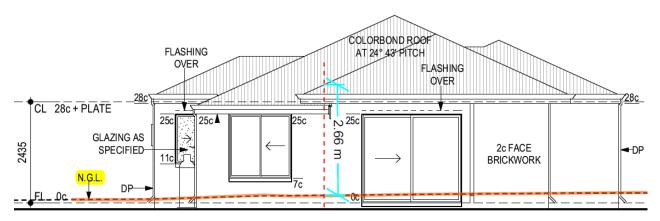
Maximum external wall height of rear facing elevation of dwelling.
